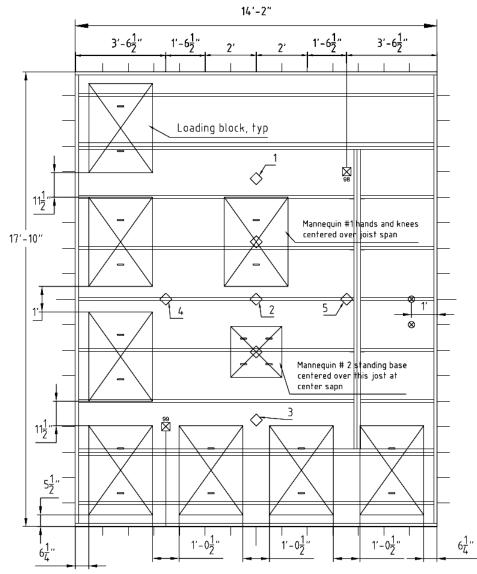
Loading and Instrumentation Layout (See Figure A.3.10).
